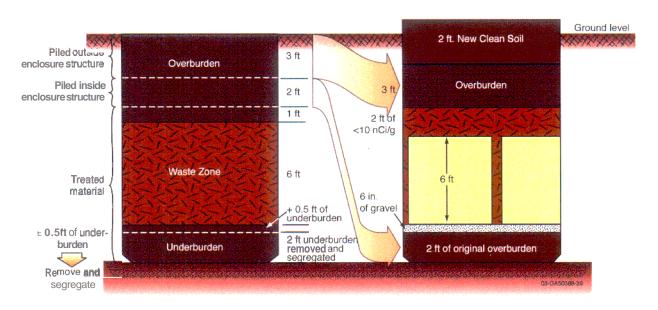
Cross-sectional view of the excavation site, both before and after retrieval.
